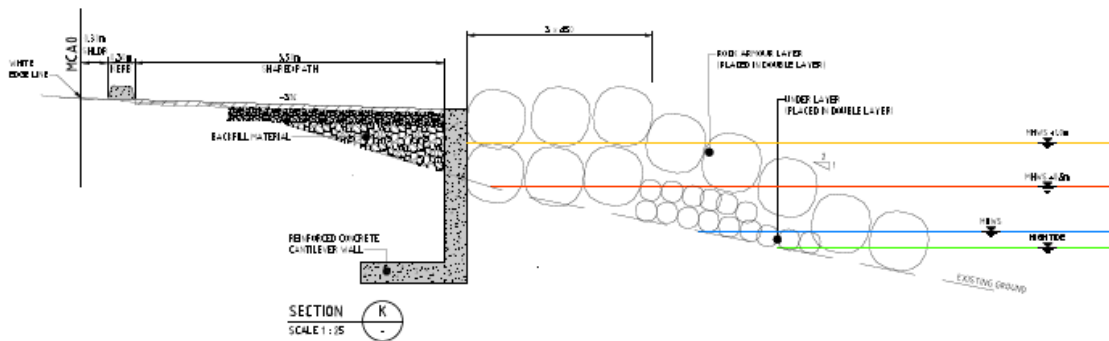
Schematic of proposed seawall at Sunshine Bay showing MHWS elevation after periods of sea-level rise. Cross section at Chainage 3960.
